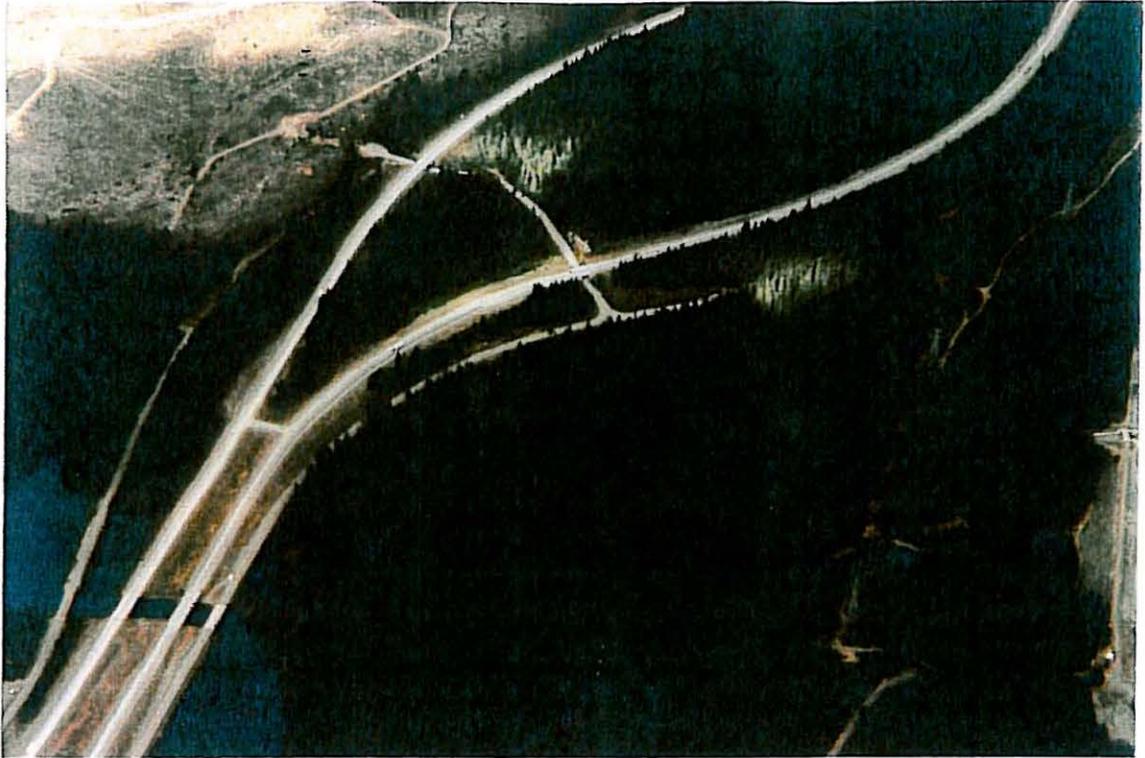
Cabin Creek. Proposed alignment under I-90 freeway utilizing existing grade separation structure.
